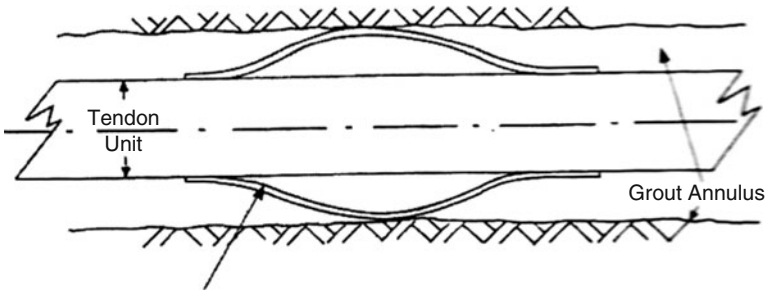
Pre-stressed rock anchor showing typical details (IS: 10270).
